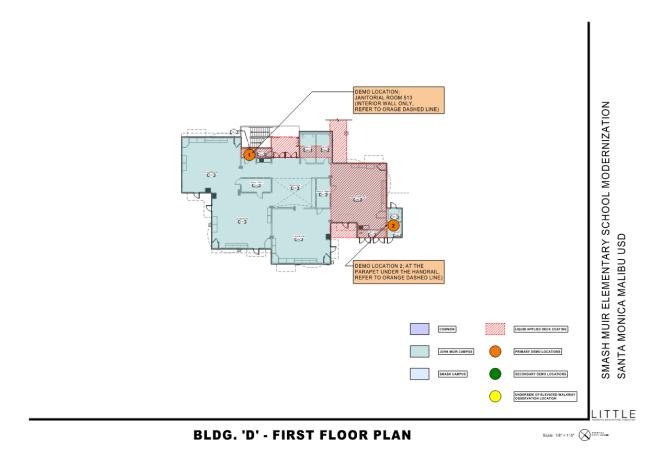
Demo Locations, Bldg D_First Floor Plan_Demo Locations.
